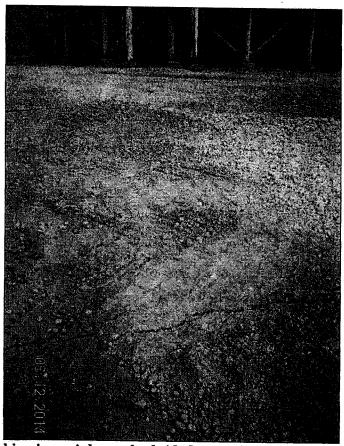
Ground cracking in periphery of subsided area adjacent to Mill Building, taken June 12, 2014. Photo courtesy of Keith Markeson.
